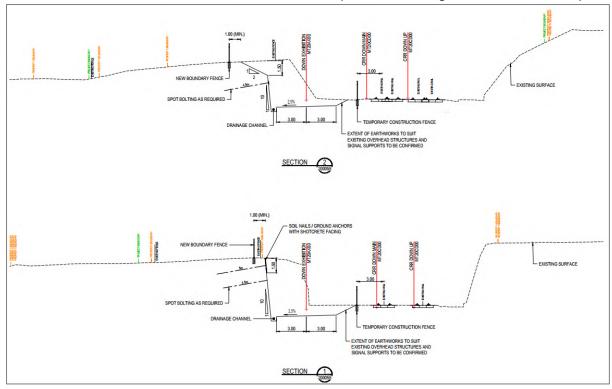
Typical Sections - Enabling Works Near Lanham Street Compound
